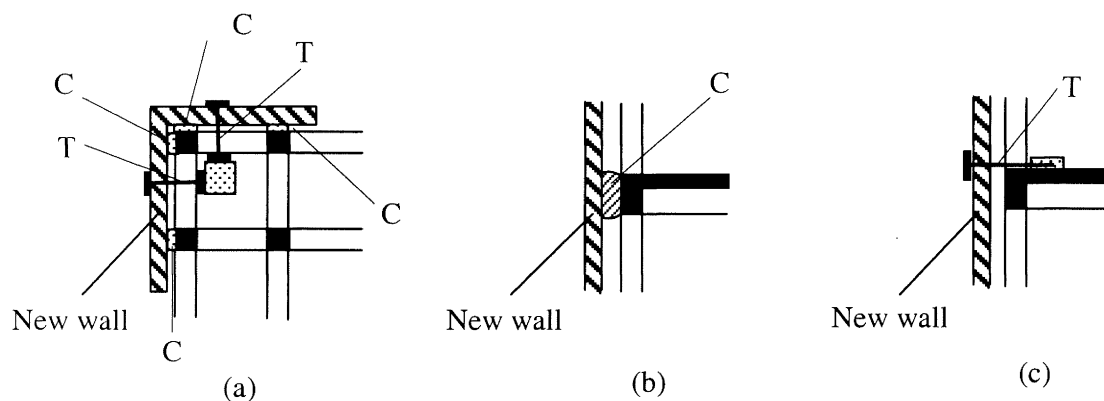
Schematic arrangement of connections between the existing building and a new wall
